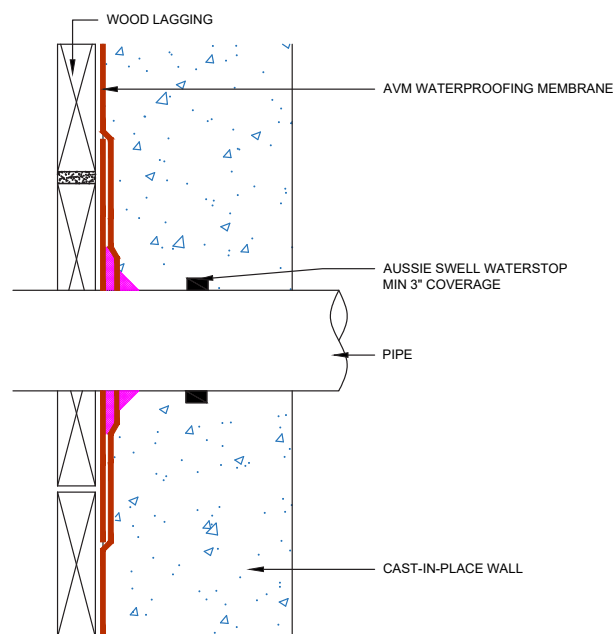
PIPE PENETRATION DETAIL WITH AUSSIE SWELL WRAPPED AROUND IT
